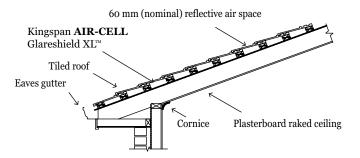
Side elevation of Kingspan AIR-CELL Glareshield XL™ in a tiled roof with a raked ceiling
